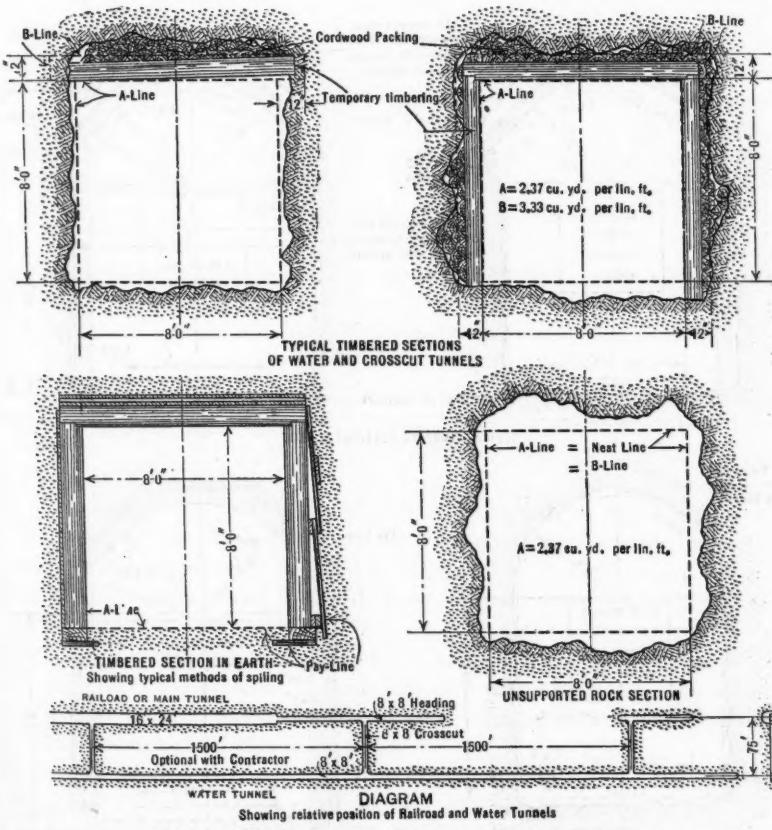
WATER TUNNEL SECTIONS, MOFFAT TUNNEL.
